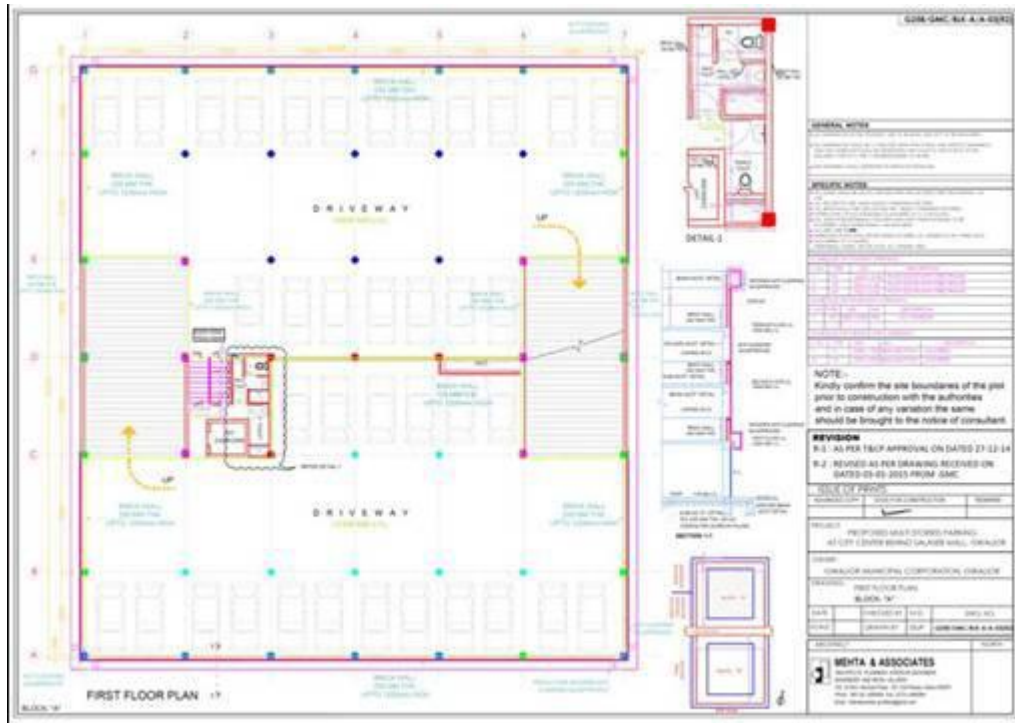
Parking Location: Salasar Multi Level Parking (First Floor-Block A)
